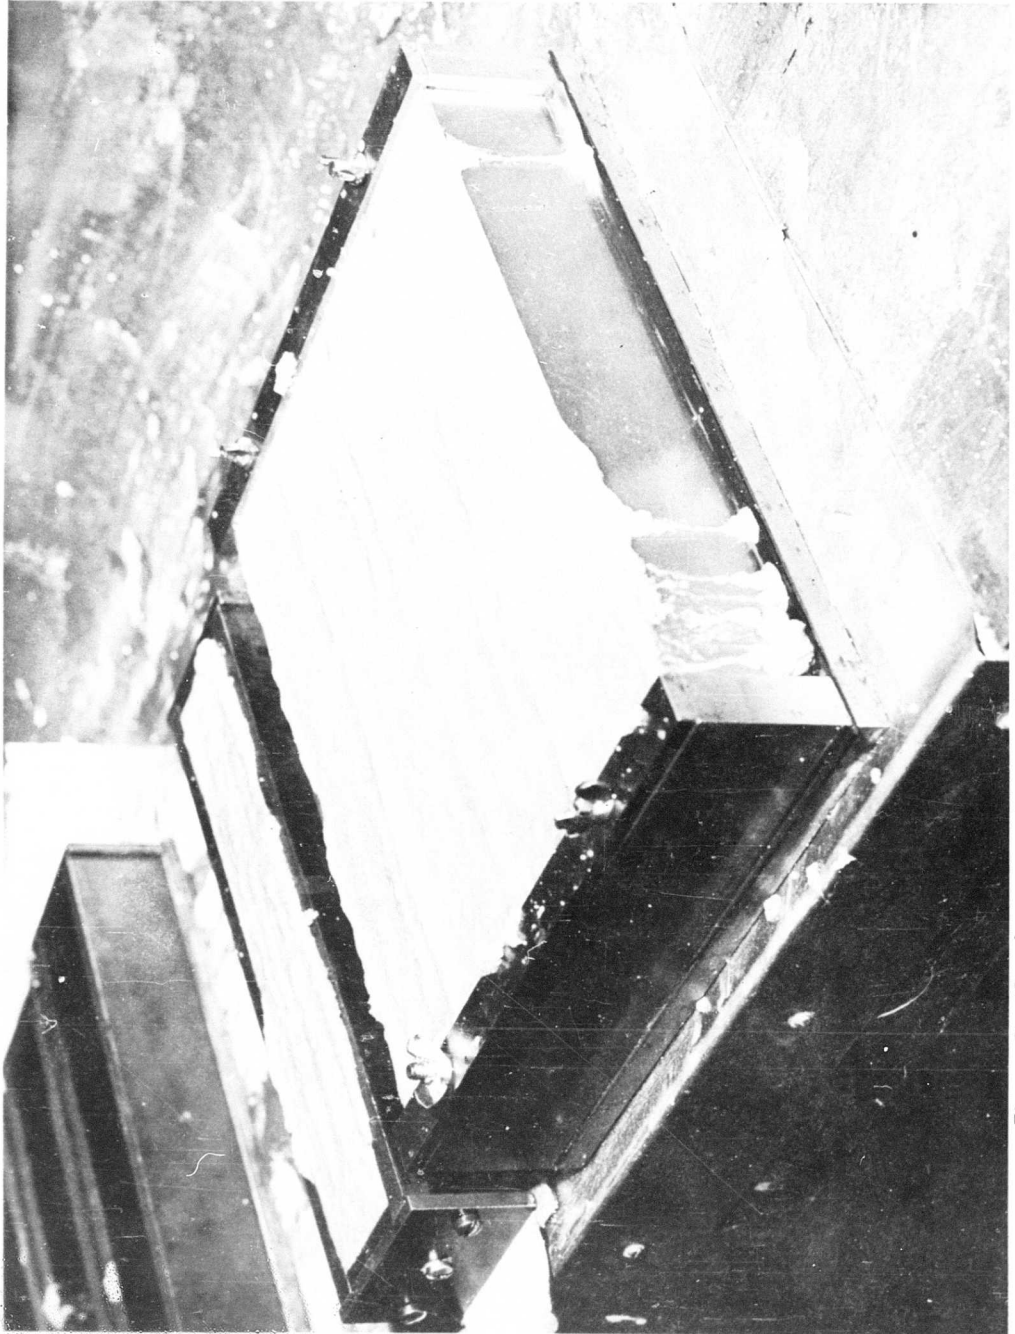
Coral mortar, after tamping into single mold and gang mold, prior to screeding.
